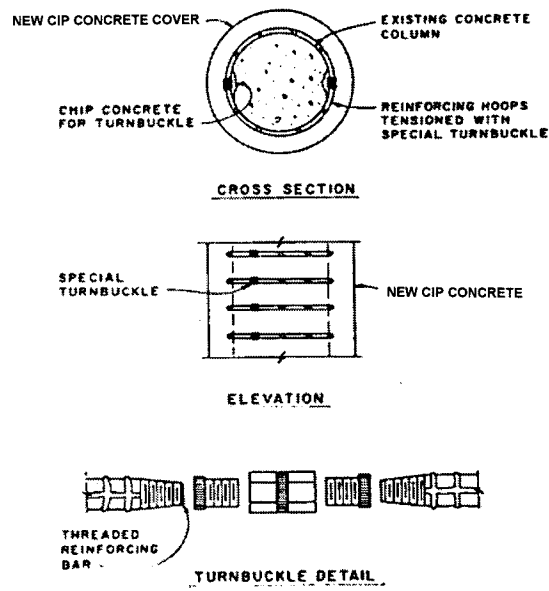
Reinforced Concrete Column Retrofit-1
